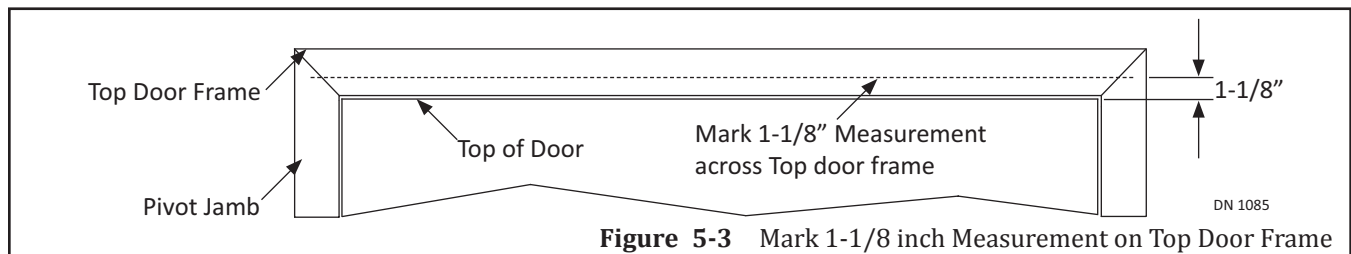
Mark 1-1/8 inch Measurement on Top Door Frame
